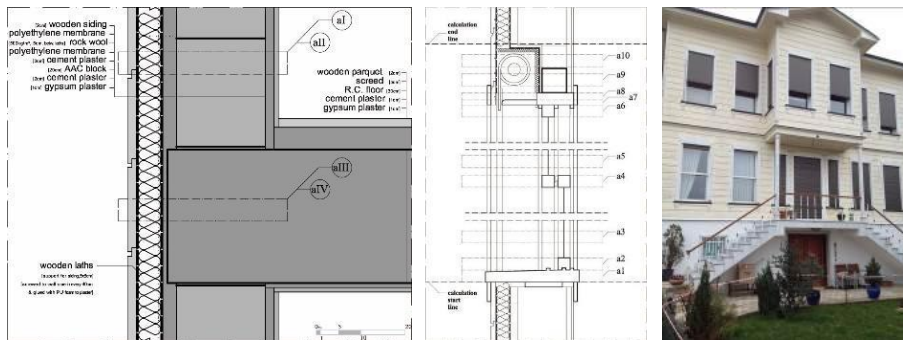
Detail section drawings of; the floor external wall knot, and the window used in R.C. reconstructions.
